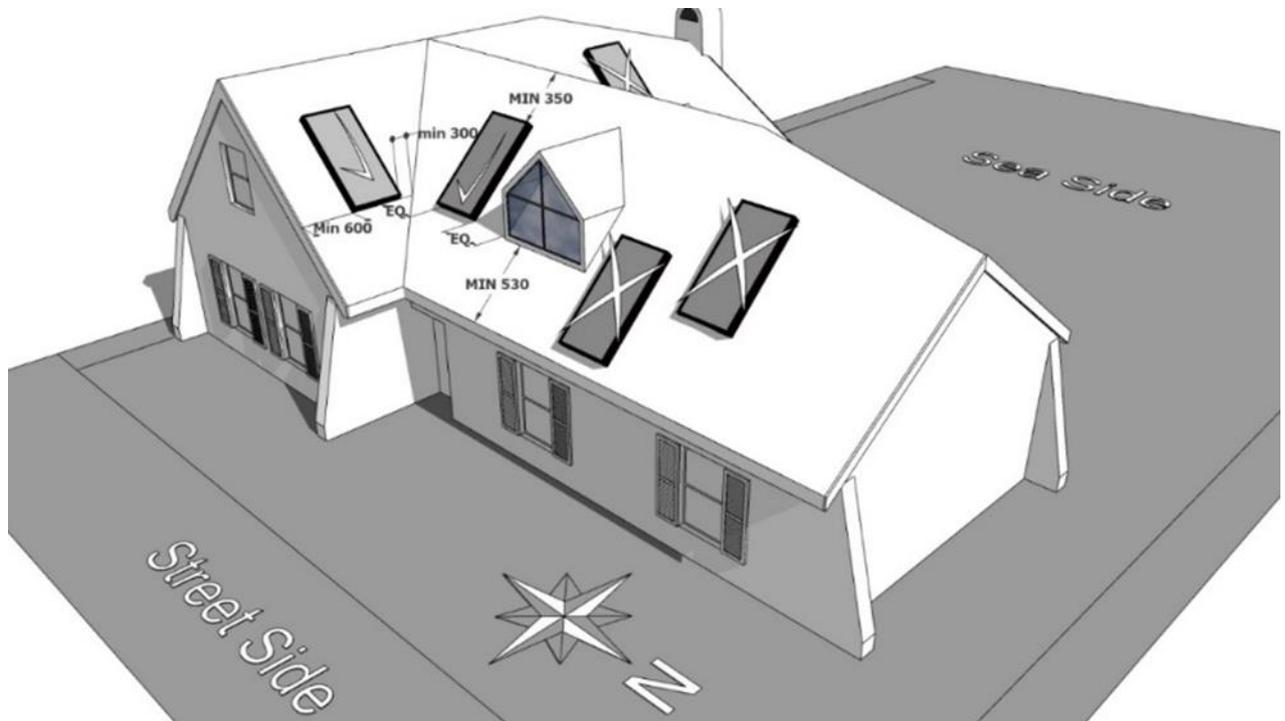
Acceptable and non-acceptable panel positions on smaller home roof pitches.
